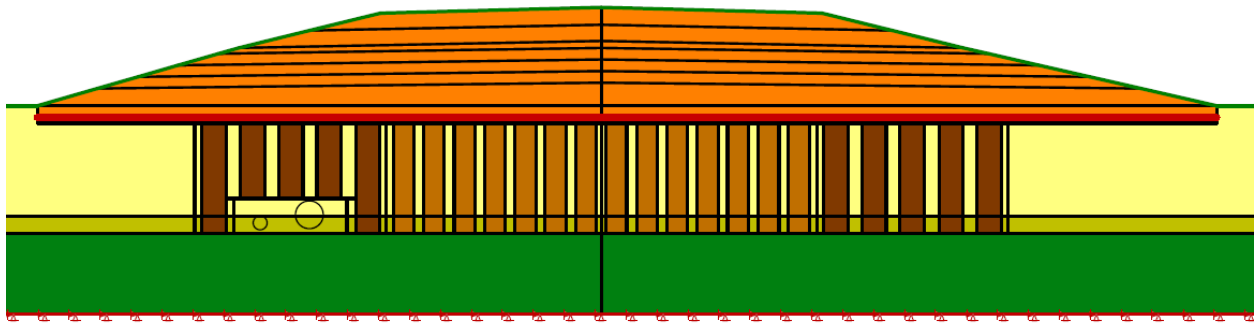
FEM South Abutment Cross-Section Model Case B
